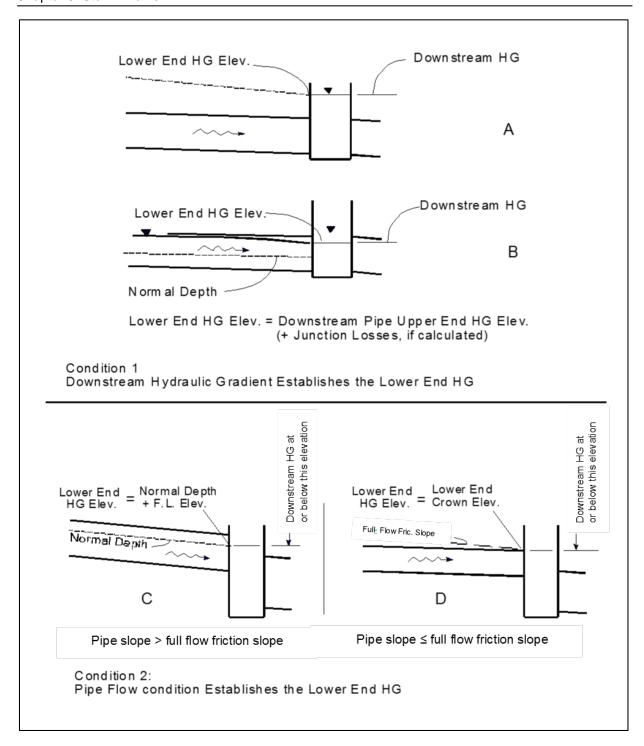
Determining the Lower End Hydraulic Gradient Elevation
